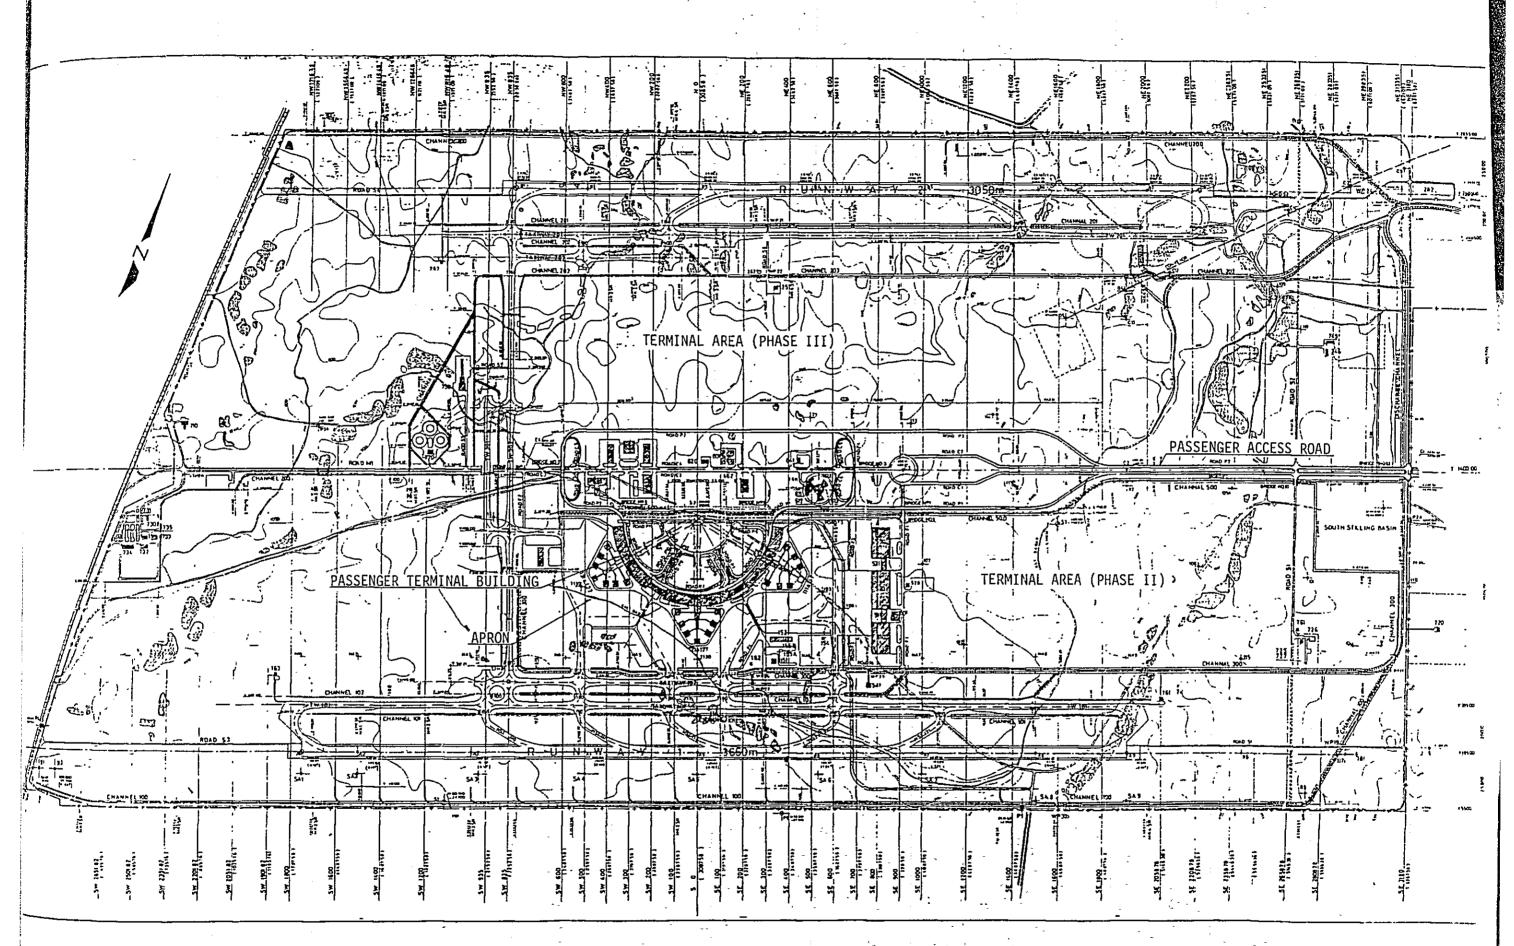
Layout Plan of Cengkareng Airport
